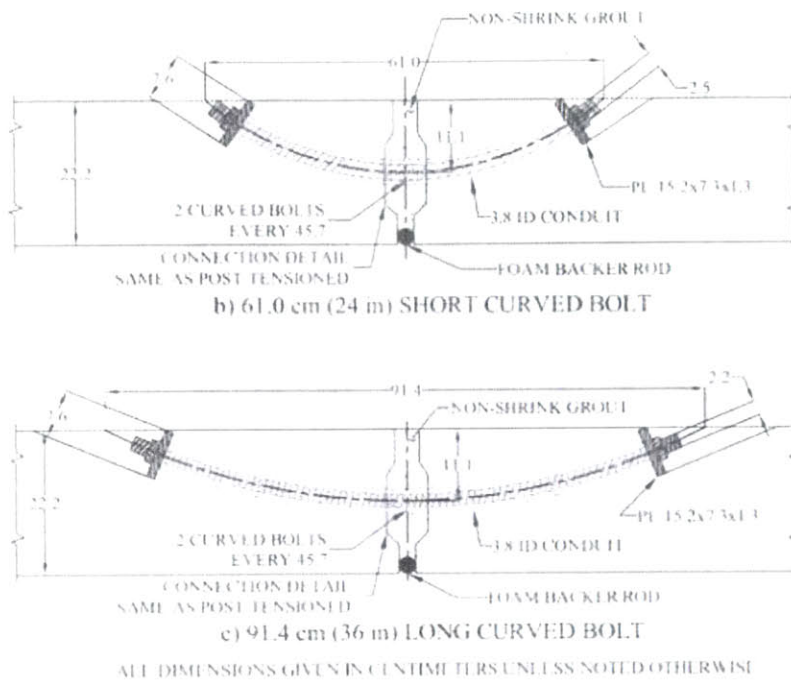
Proposed Curved Bolt Connections (Porter 2010)
